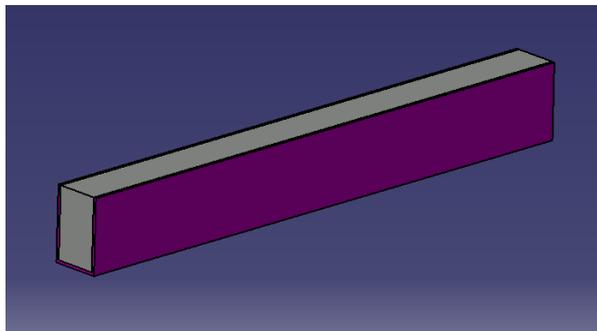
Reinforcement of concrete beams with a U-shaped model of TRM and FRCM materials
